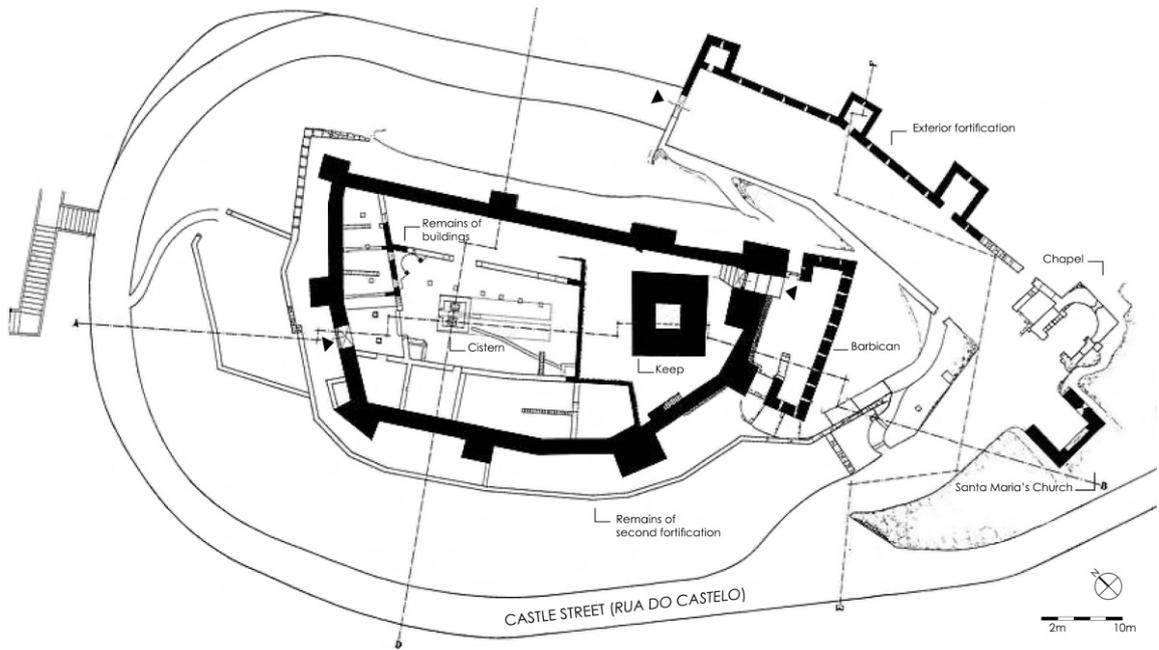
Plan of Pombal Castle (Source: SIPA, n.d.)
